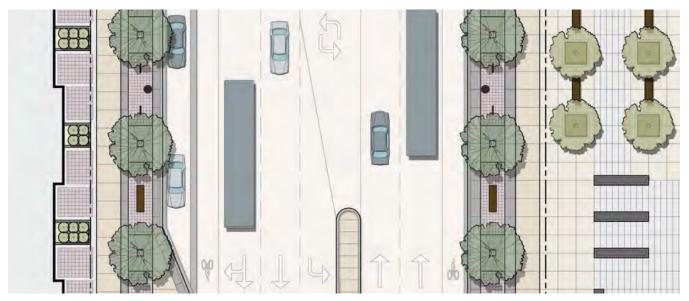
Section M2-M2: Conceptual treatment along McLaughlin Road (north of Spine Road intersection) (37.5m ROW) with 4 thru lanes, left turn lane, island median, on-street bike lanes, layby parking and street trees in urban boulevard condition adjacent live-work units and Village Square (looking north).
